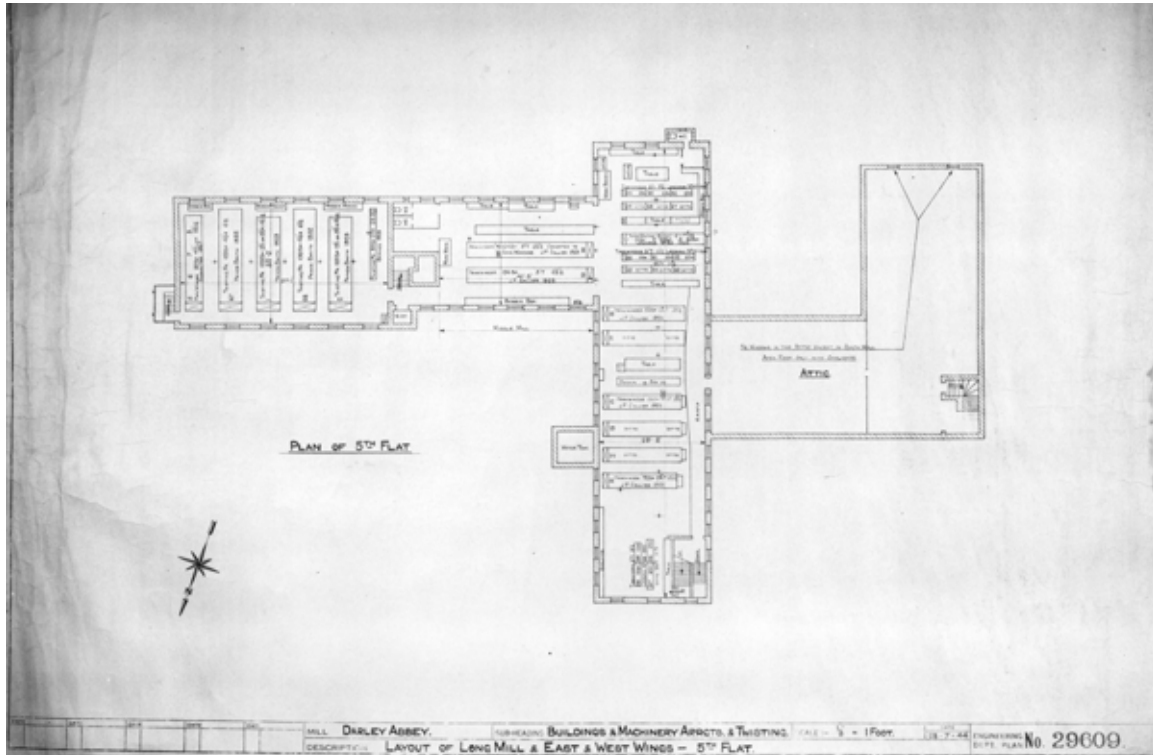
The 1944 fourth-floor plan (BB001856; courtesy of Anthony Attwood)
